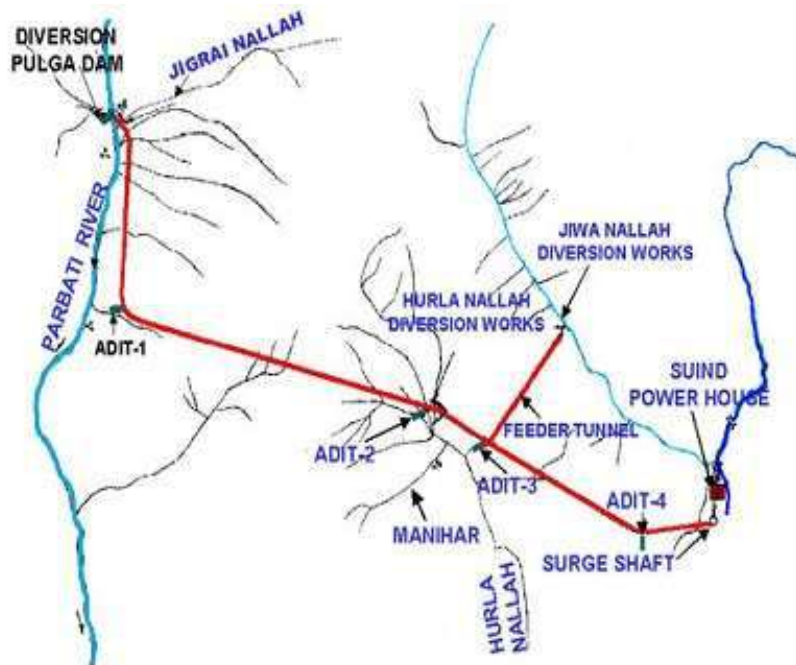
Layout Plan for Parbati Hydroelectric Project -Stage II (Ref. 21)
